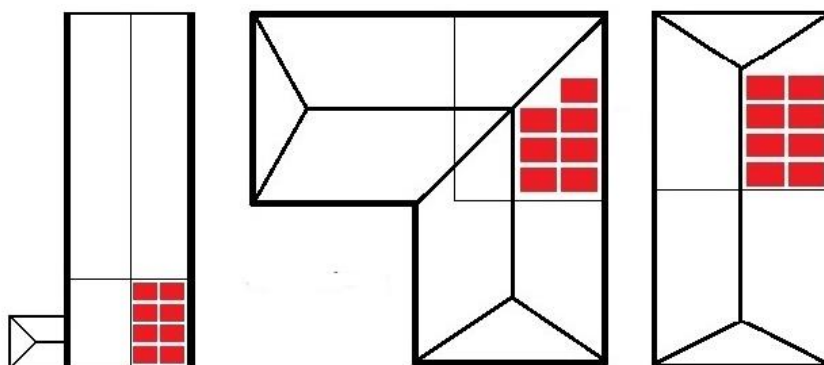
PV Layout for Dwelling 1,2 and 3
